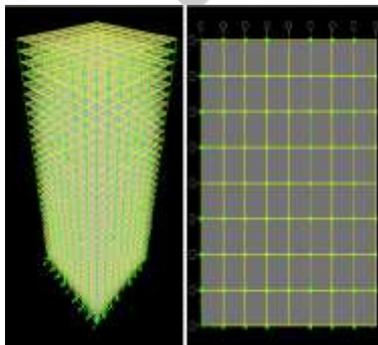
Plan and 3D view of the building model with different Floating Column Location.
